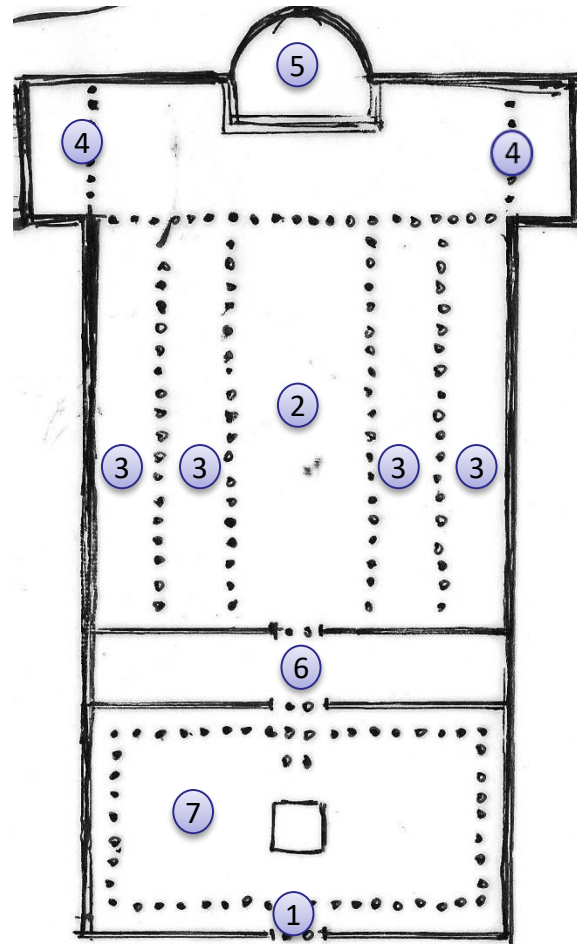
Roman Basilica Sketch Floor Plan (Author 2021).
